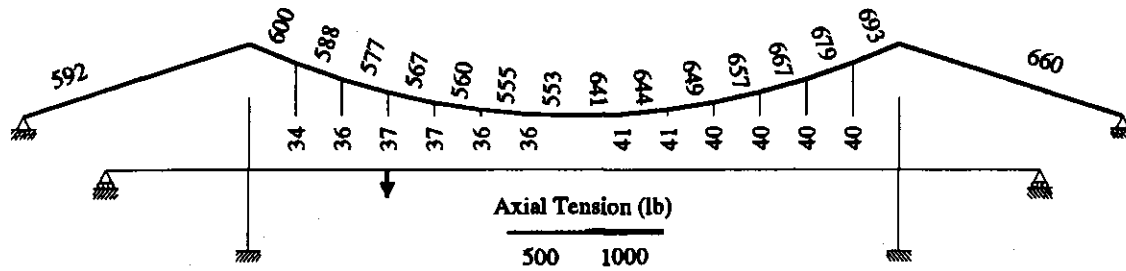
Live Load Forces and Deflections in Truss of Stiffened Beveridge Bridge with Continuous Truss
